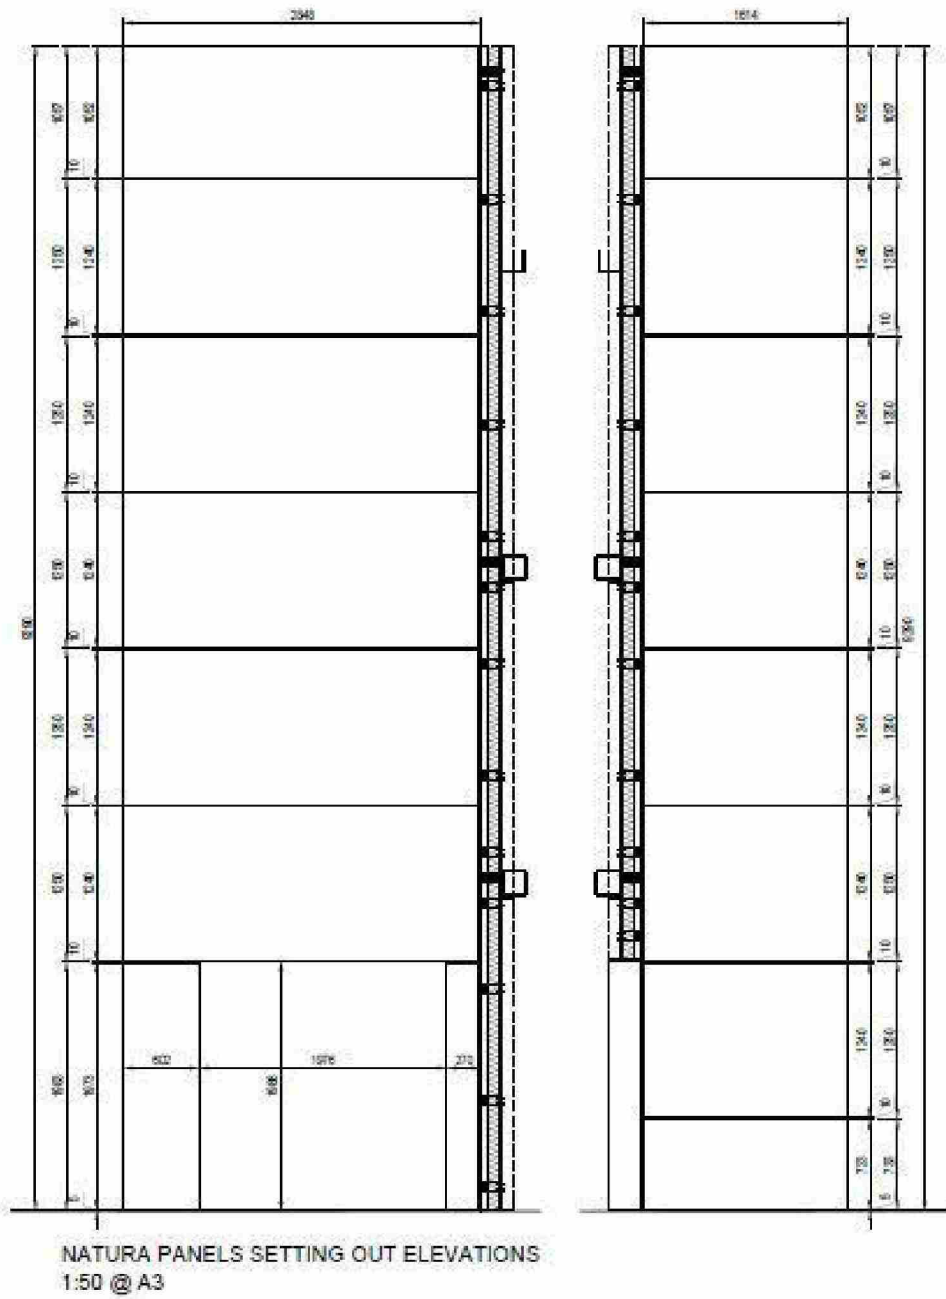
Panel layout (drawing supplied by Test Sponsor).
